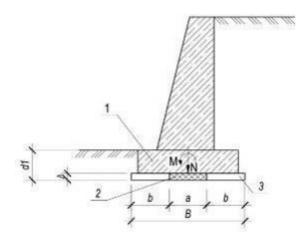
Mass retaining wall with a longitudinal centrally located cut-out on the bottom
